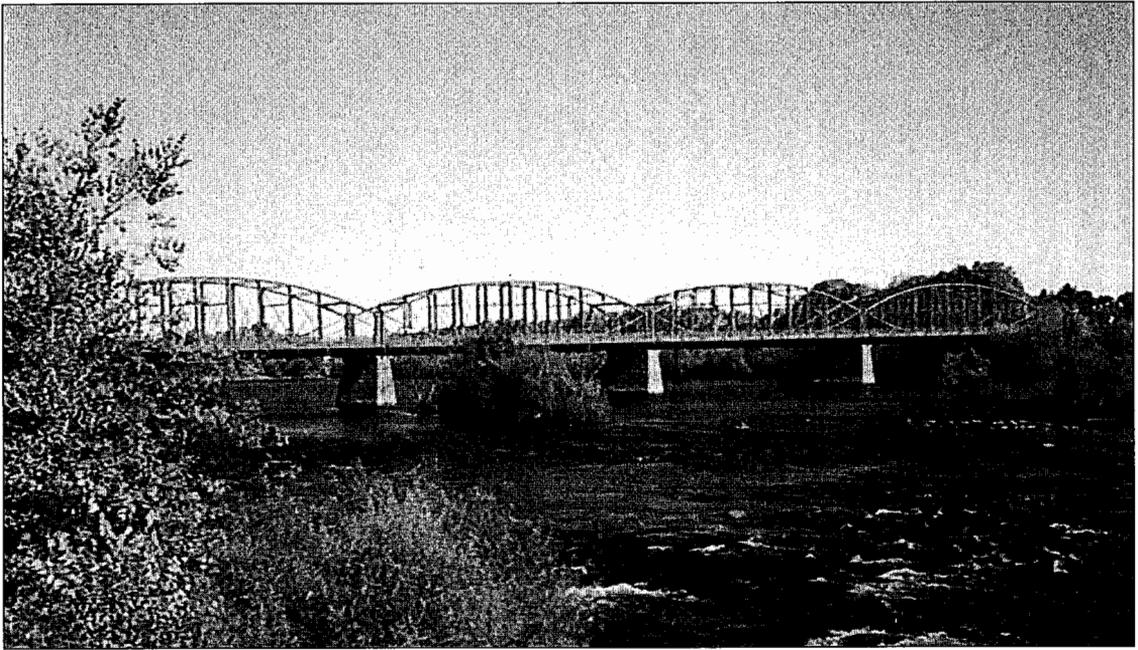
The Bardwell's Ferry Bridge in Shelburne.
